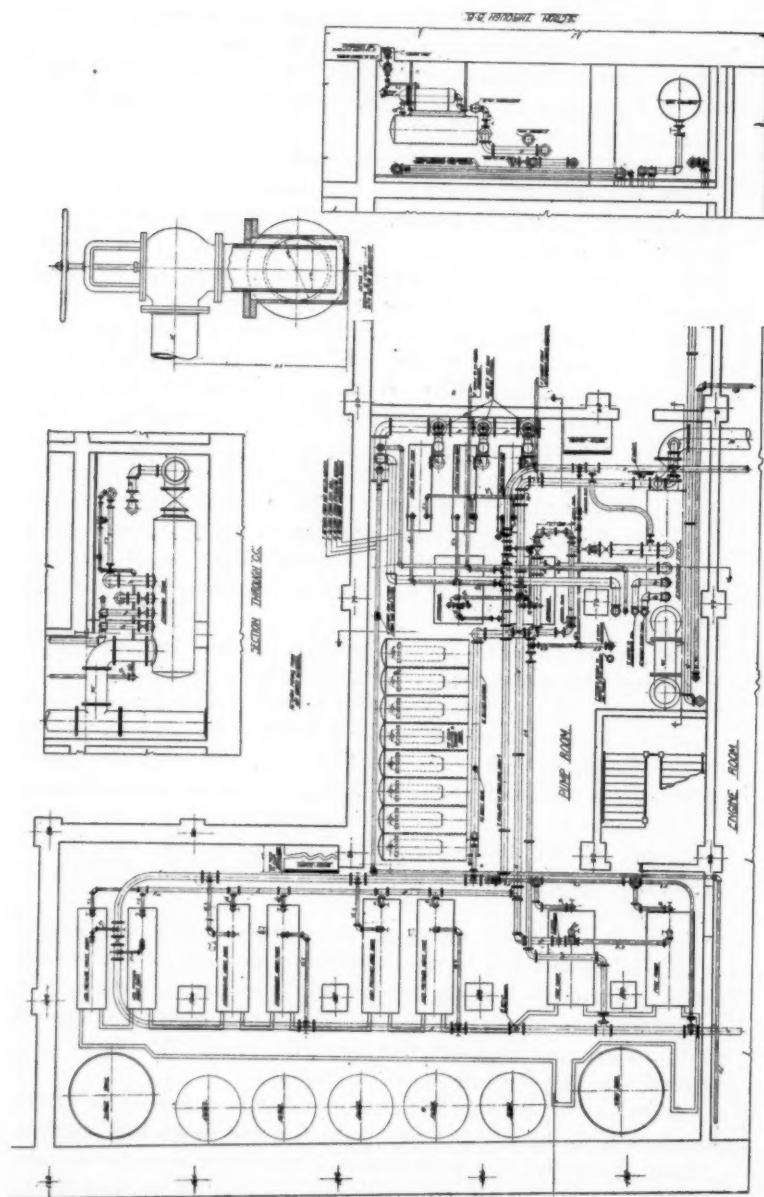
PLAN OF PUMP ROOM OF THE EQUITABLE BUILDING.
